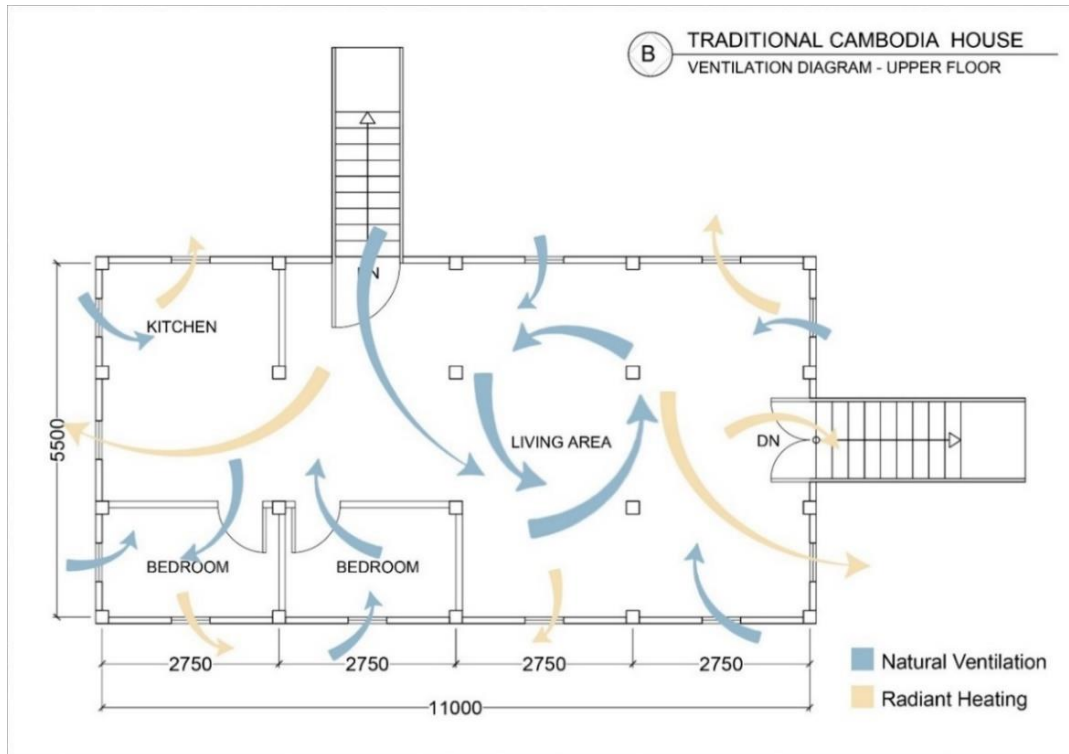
Natural Ventilation Diagram of the Traditional House – Floor Plan (Author)
